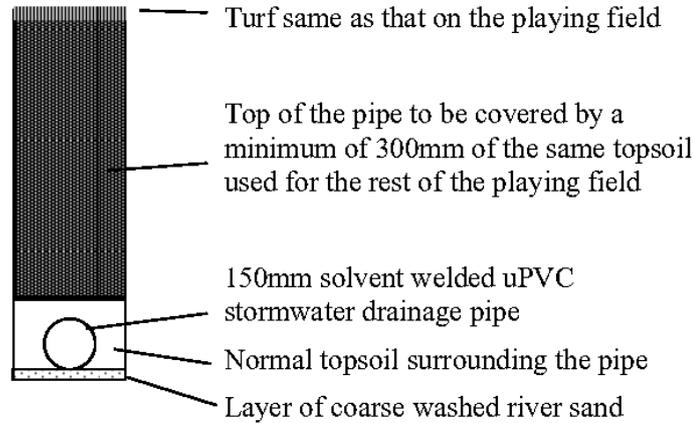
Cross section of the drain that runs from the wicket table to the swale or stormwater pipe on the edge of the playing field.
